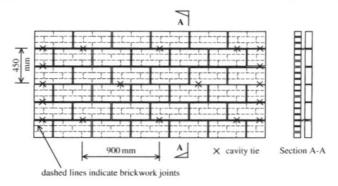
Typical cavity tie positions in a wall made from standard format bricks and blocks
